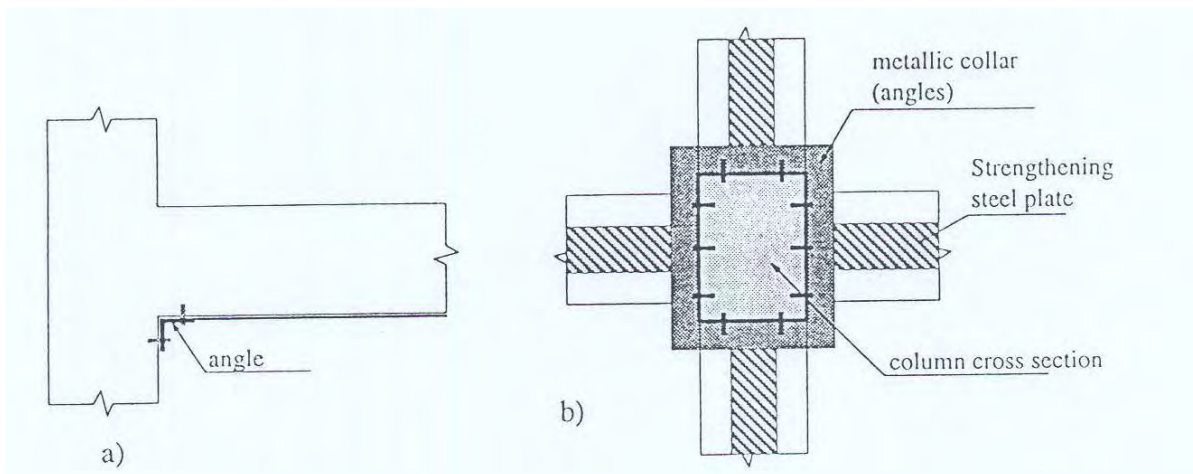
Connection details of the steel plates: a) Beam edges; b) Beam column connection.
